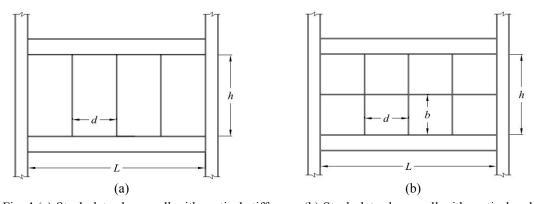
(a) Steel plate shear wall with vertical stiffeners; (b) Steel plate shear wall with vertical and horizontal stiffeners
